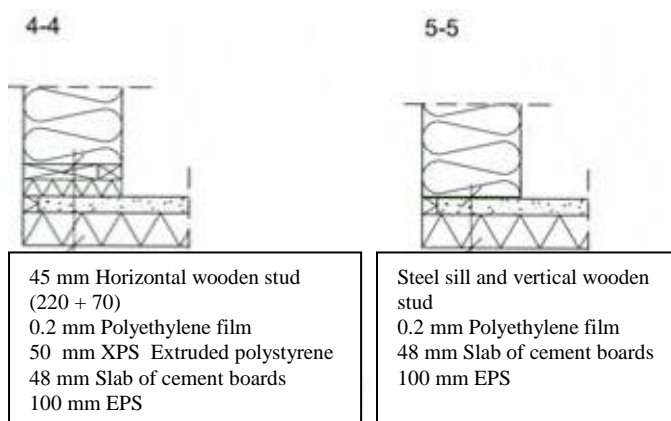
Vertical sections through Sections 4 and 5, neither of which has a fitting sill. Section 4 has 50 mm of XPS beneath the horizontal stud in order to make the wall less accessible to water.
